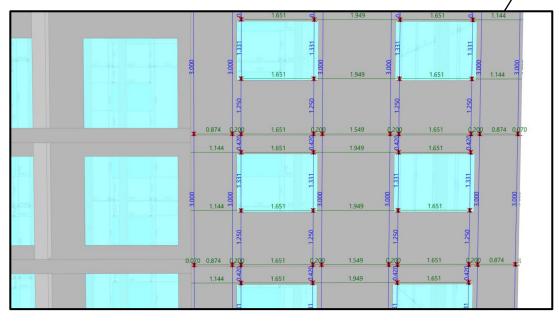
Anchors disposition – NORTH Perspective View B_Detail.01
